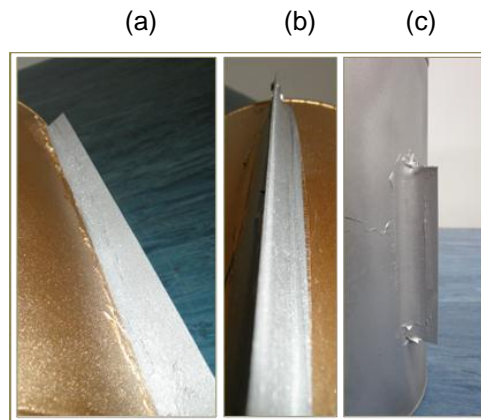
(a) and (b) Full length stiffeners and (c) partial stiffeners connected to the specimen.
